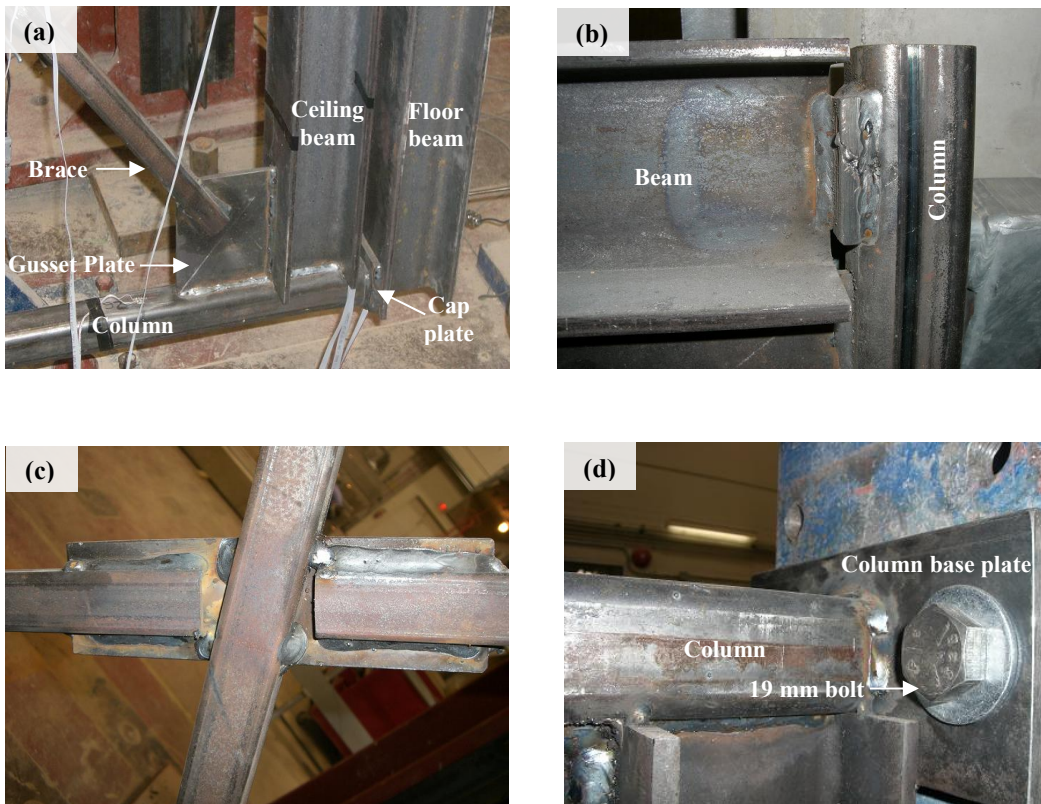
(a) Some member and connection details in MSB specimen (b) Beam-to-column connection in Regular specimen (c) Brace intersection detail of specimens (d) Column base plate connection to reaction frame
